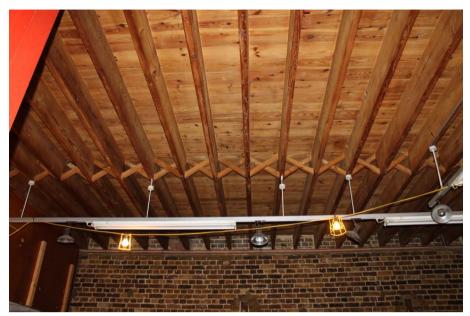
Eastern end of ground-floor of Structure 7. Photograph taken facing north-east.
